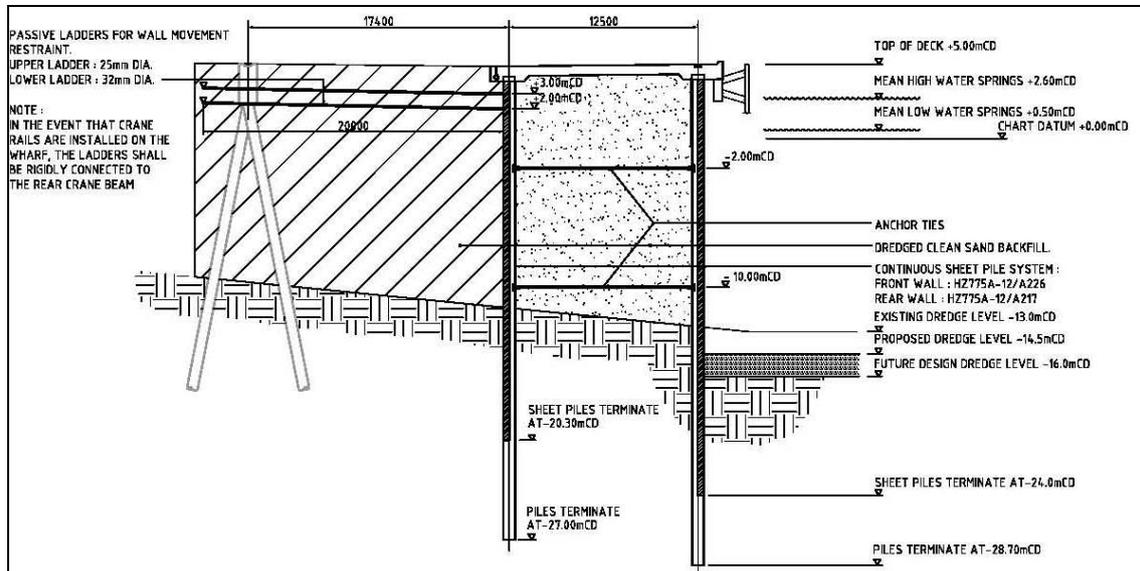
Berth 3 typical twin sheet pile wall cross-section
